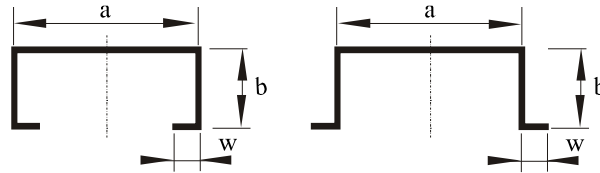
Members with edge stiffeners: a) lipped channel section, b) top hat section.
